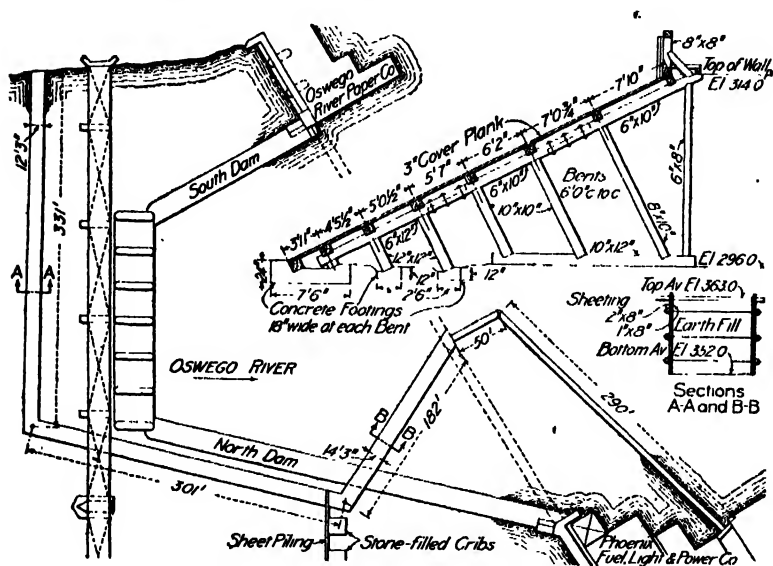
A-Frame Cofferdam Used on New York State Barge Canal.
